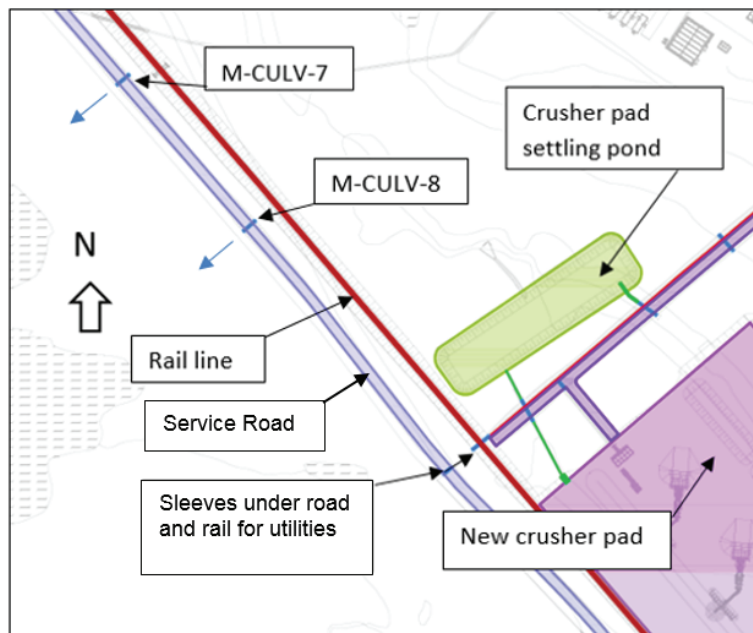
Rail Service & Access Road - Cross Drainage Culverts
